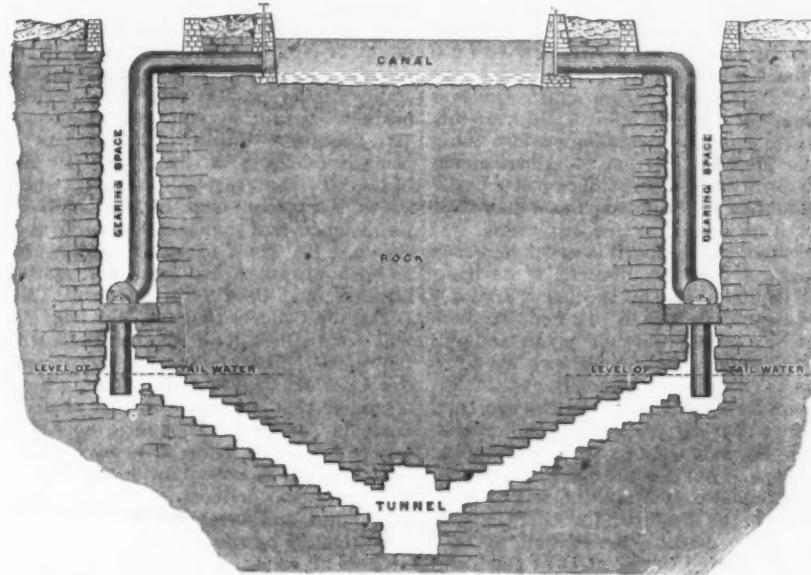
Enlarged Cross Section of Main and Branch Tunnels and Wheel Pits.
